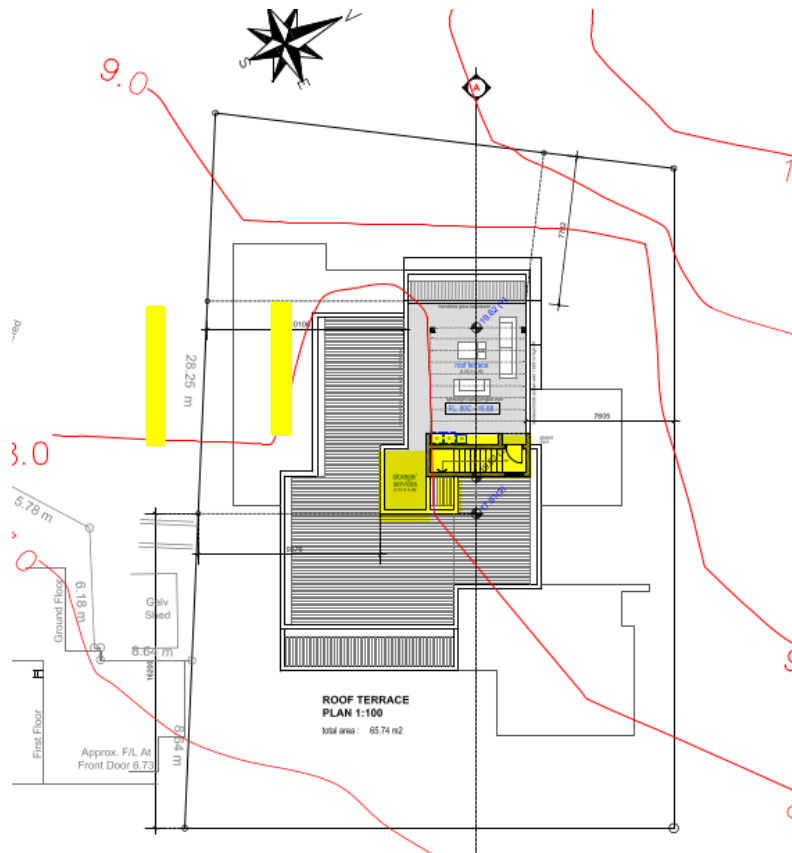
Yellow highlight showing enclosed area of the roof terrace above permitted height
